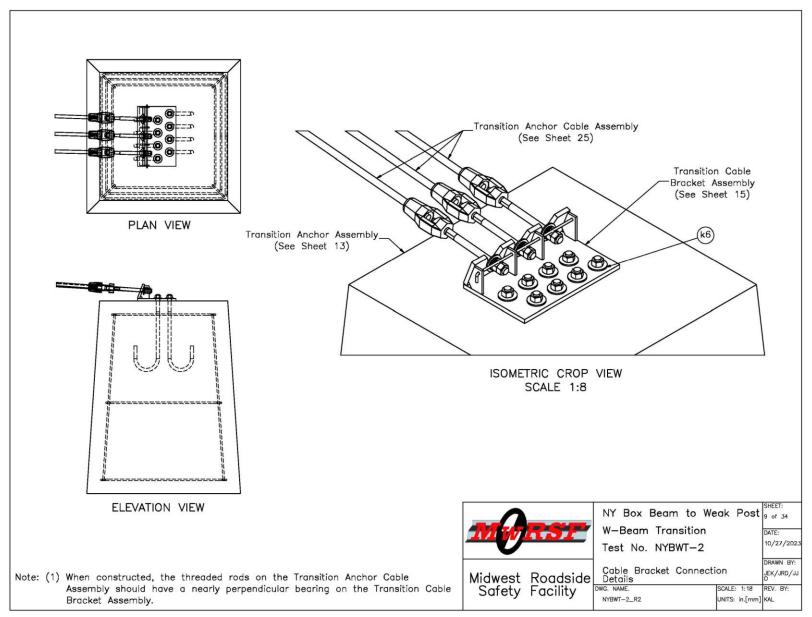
Cable Bracket Connection Details, Test No. NYBWT-2
